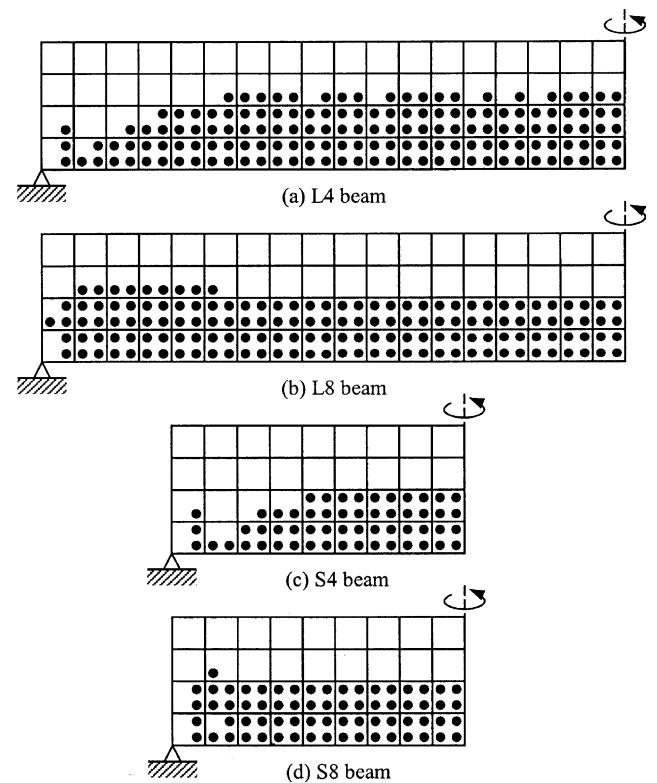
Crack patterns of reinforced concrete beams strengthened by $[0]_4$ FRP at the bottom and under ultimate loads.
